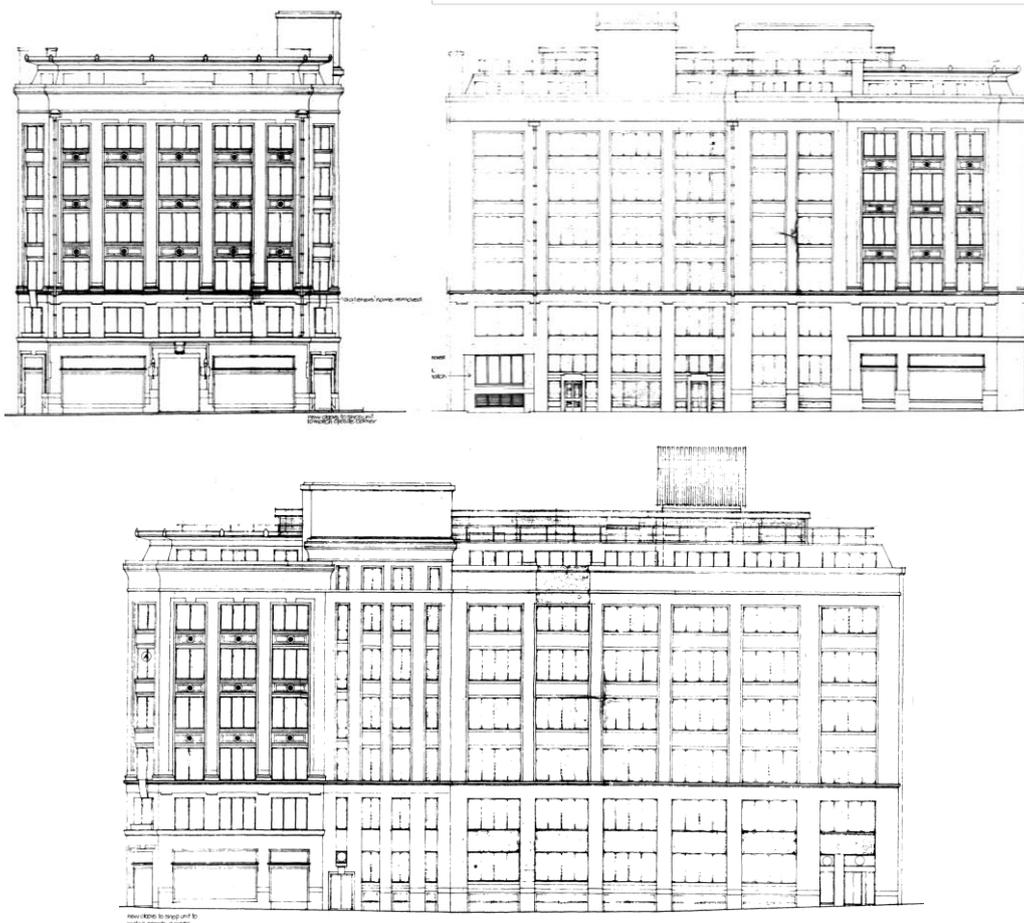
Extract from application 8670207 showing the proposed Kingsway and Keeley Street elevations (top) and the Wild Court elevation. Note additional lift overrun.
